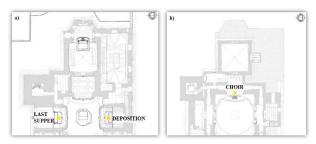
a) Ground floor planimetry; b) First floor planimetry
